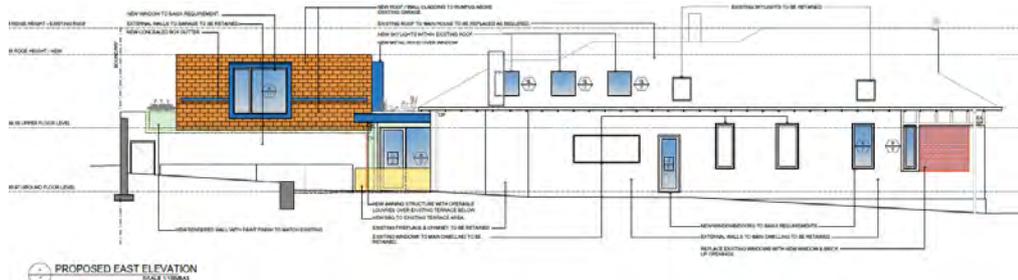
Proposed east elevation. (Source: Castlepeake Architecture)
